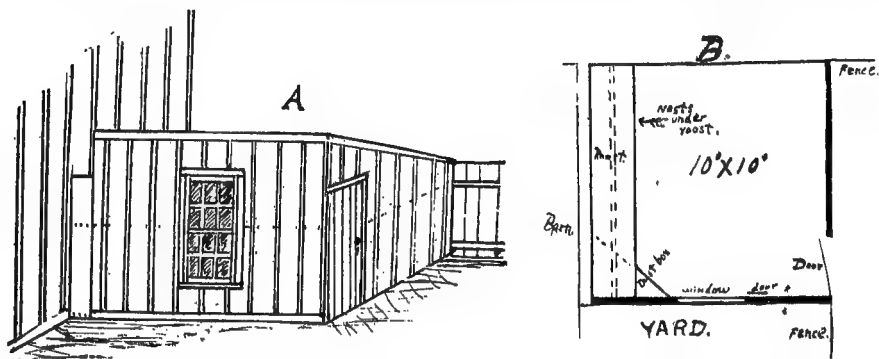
A Cheap Small Poultry House. A.—perspective. B.—ground plan.
